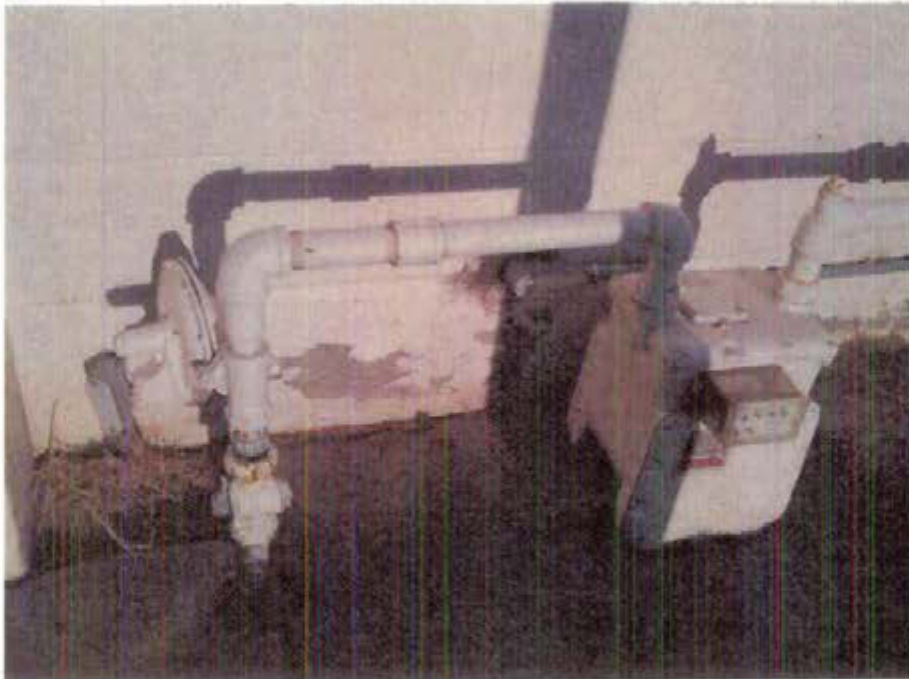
Lead wipe sample 81513-HMLTIARM-06 collected from the vault floor.
